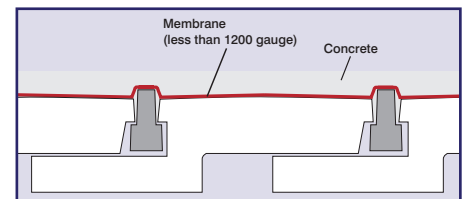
Floor construction using Poly Plus Extra Panel with membrane barrier
